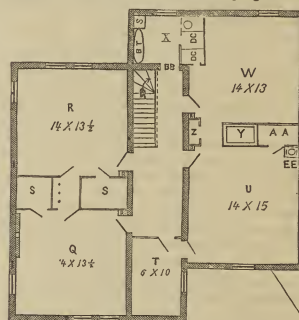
SECOND FLOOR OR CHAMBER PLAN.
